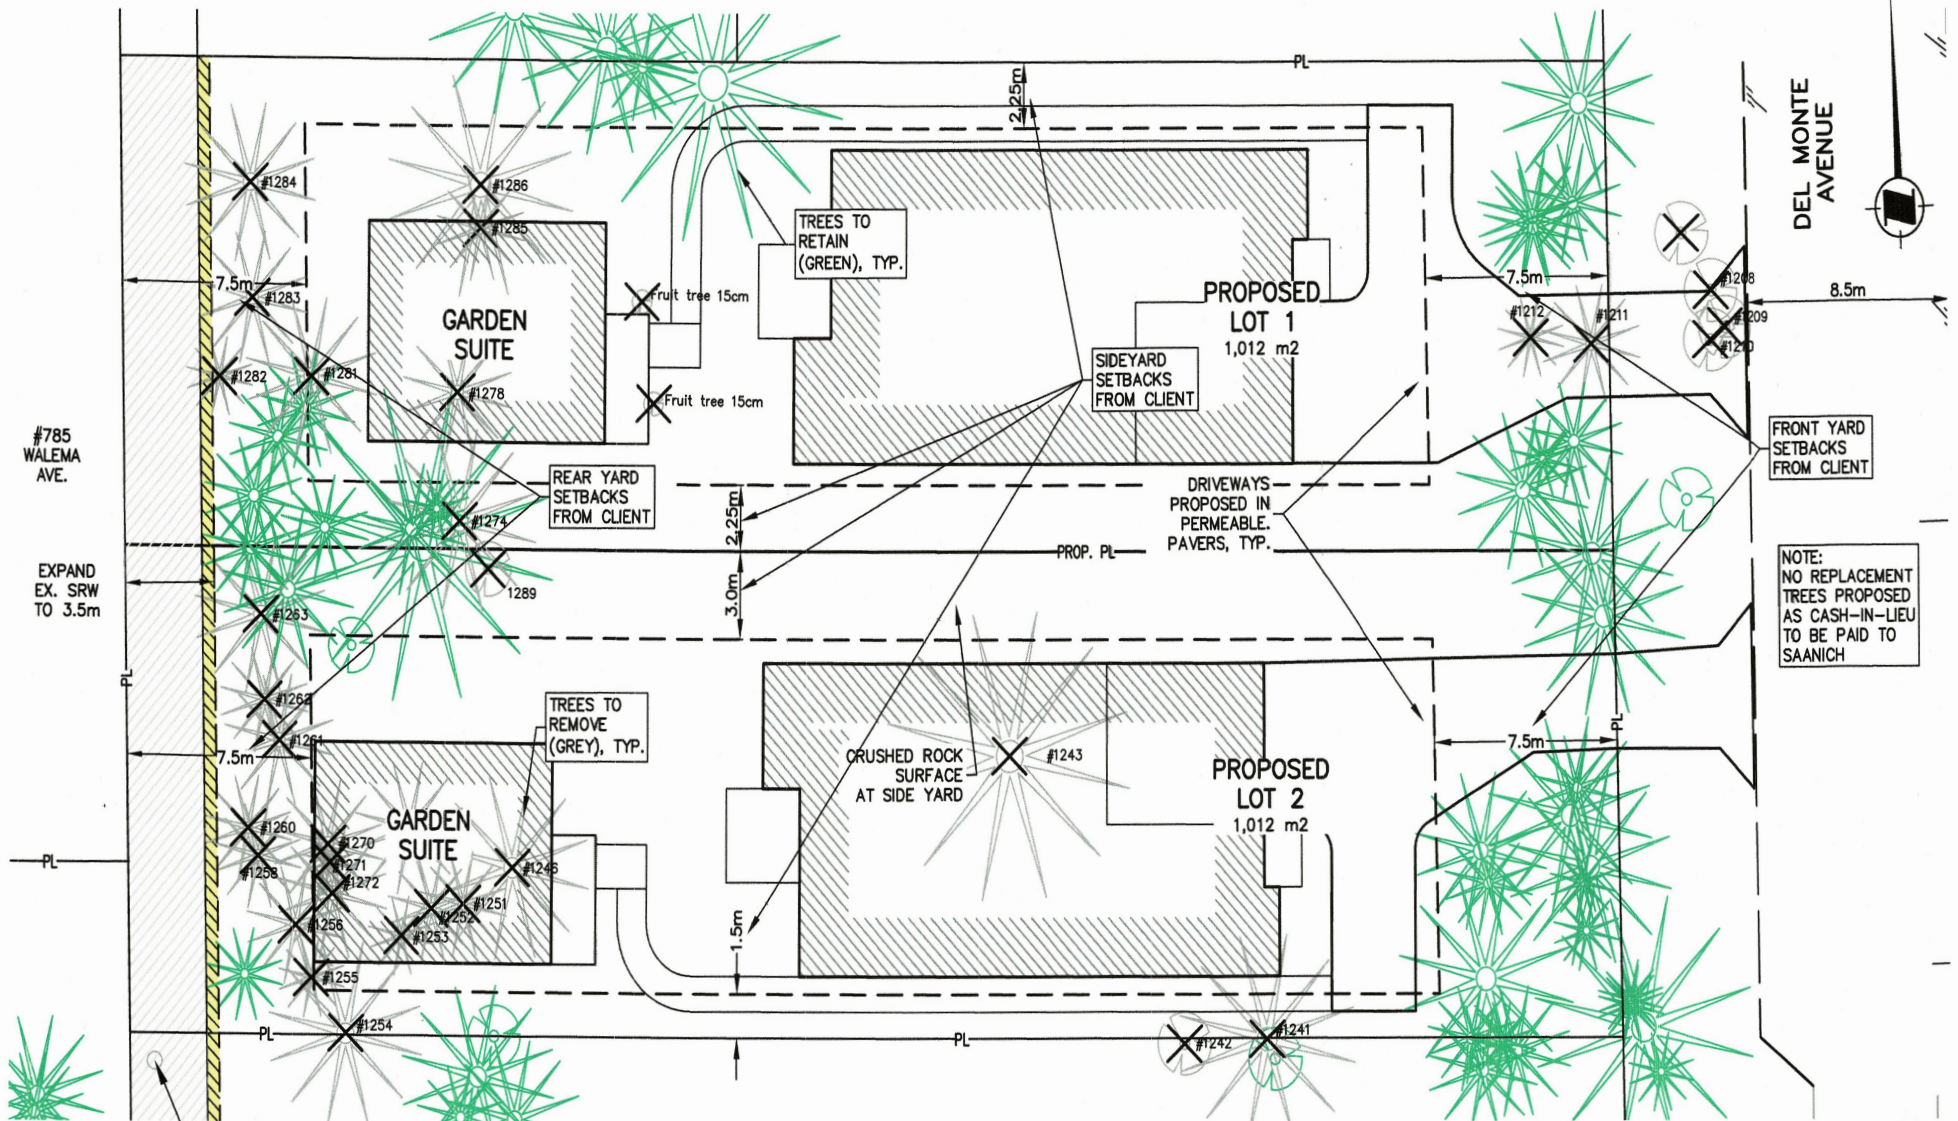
STRIPPED DOWN VERSION OF SITE PLAN
